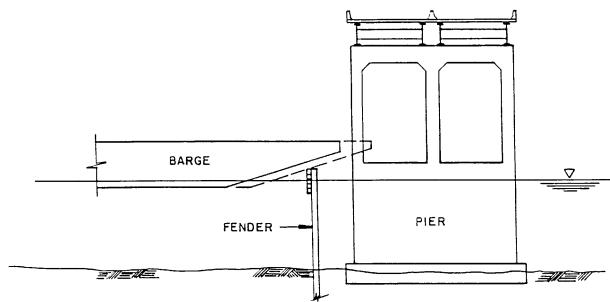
Elevation of Barge Bow Impacting Pier
